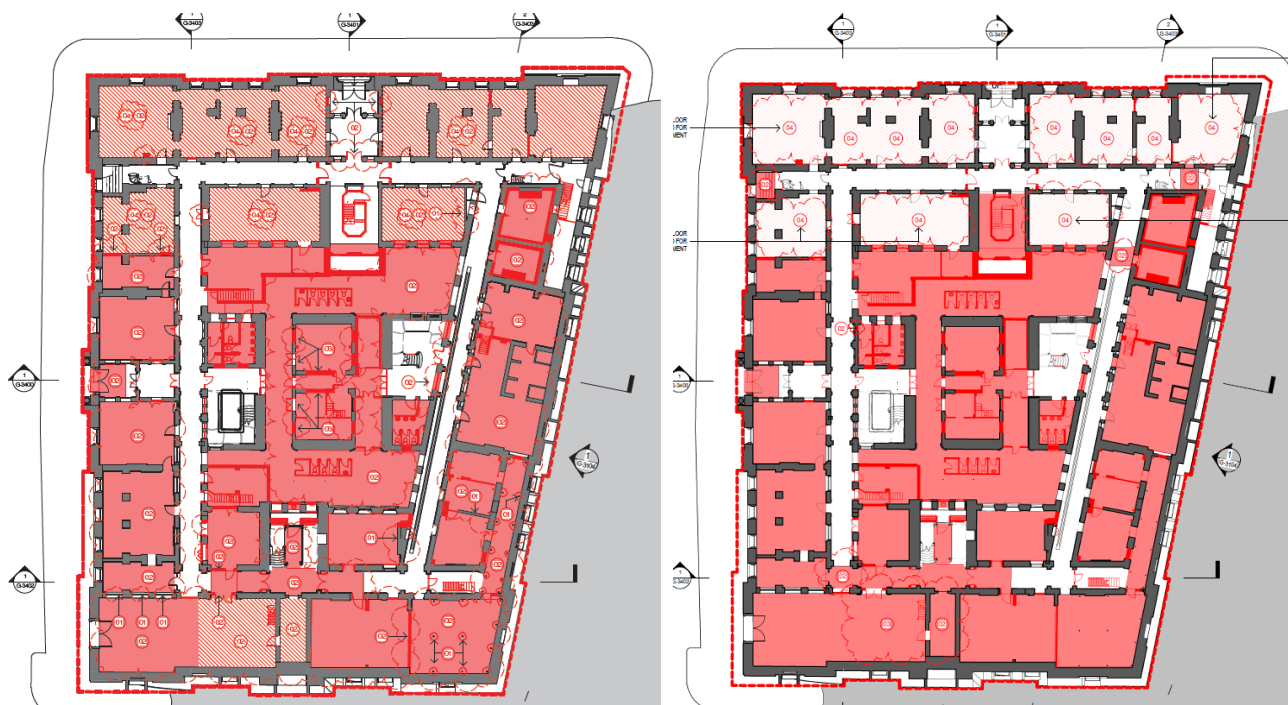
Approved Mod 9 Lower Ground Level demolition (left) and proposed Mod 15 Lower Ground demolition (right)
